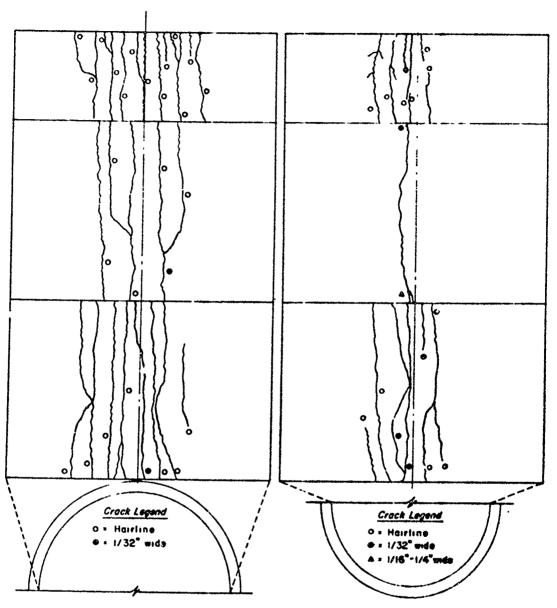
Crack survey of top half, developed; concrete Conduit 3.2e,
